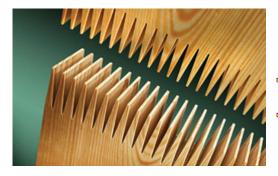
Precision finger joint Source: www.kaiserbeaum.com
